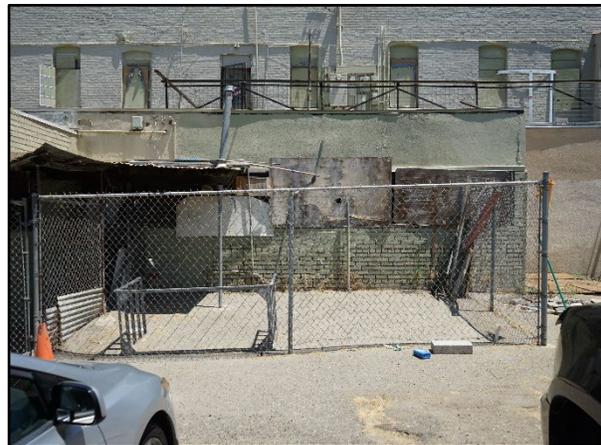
Closeup of long one-story addition at center of the rear elevation, facing northeast.
